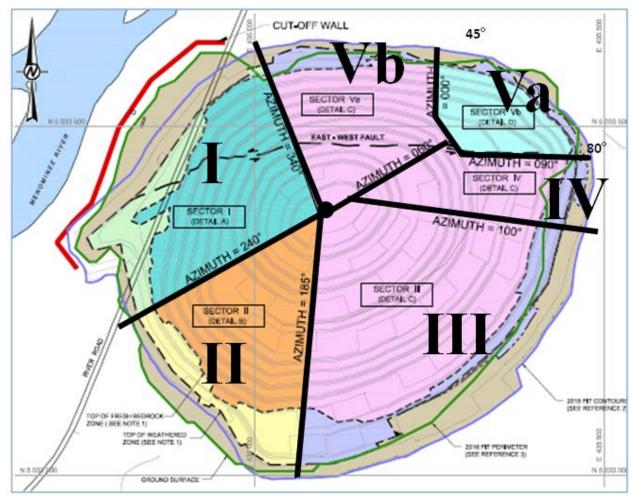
OPEN PIT SLOPE DESIGN SECTORS
